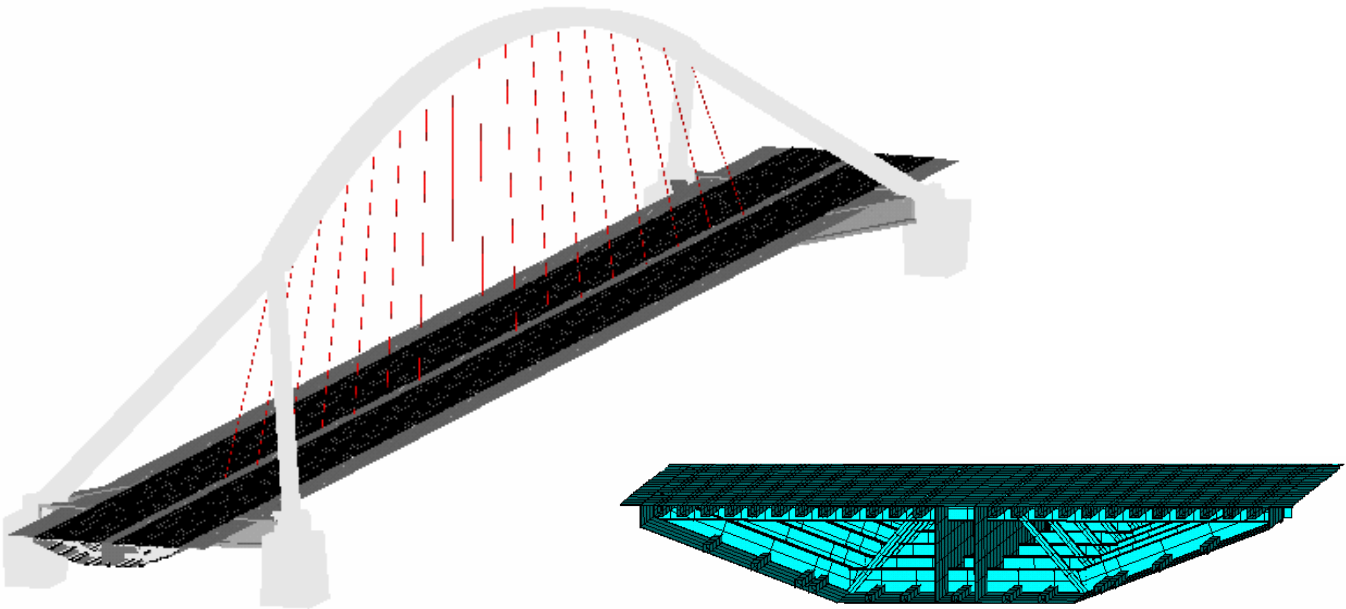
The 3-D FE model of Barqueta Bridge (left hand-side) and detail of the deck cross-section model (right hand-side)
